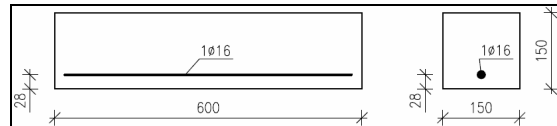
Reinforced concrete element performed to the test (own elaboration)
